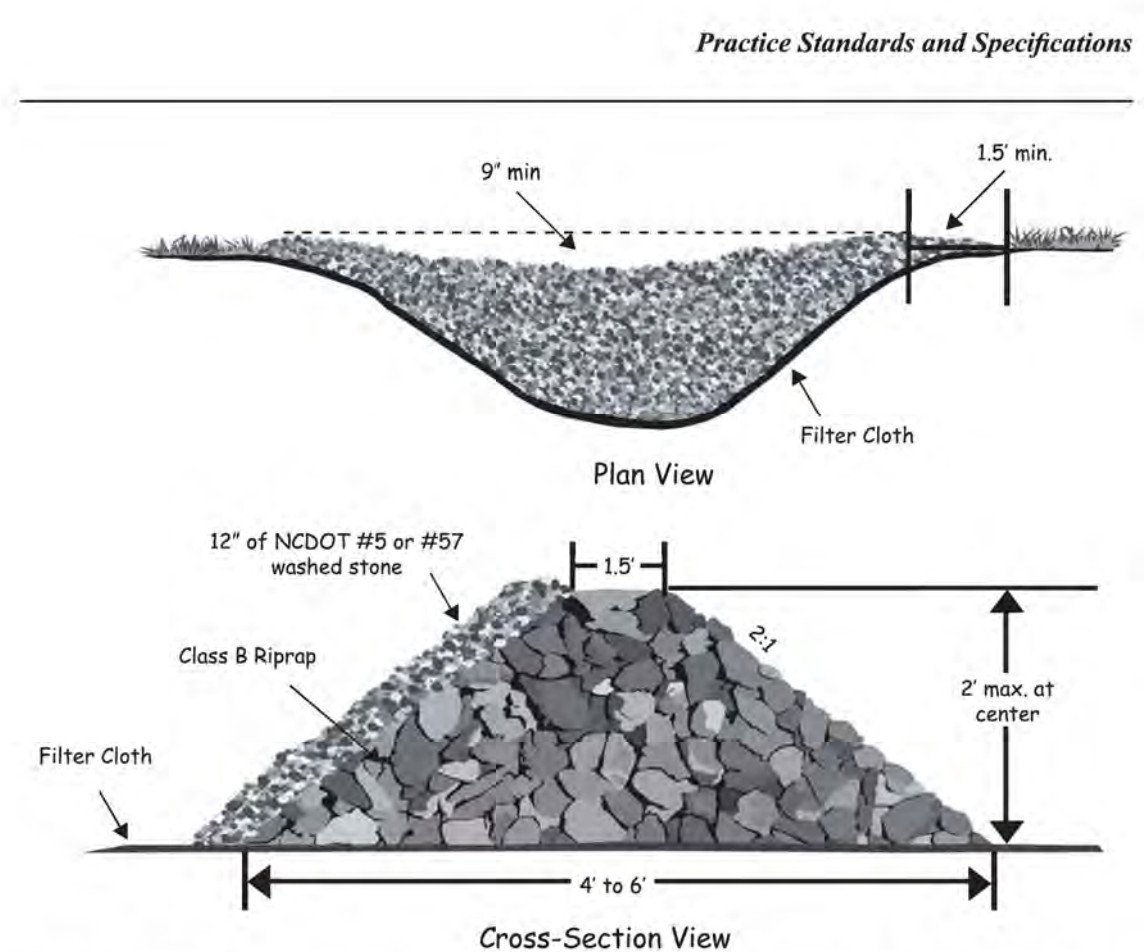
Stone check dam stone should be placed over the channel banks to keep water from cutting around the dam.
